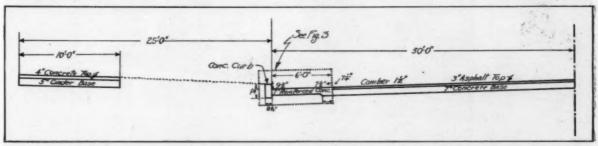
Showing a Typical Section of the Boulevard from Liberty Street to Mohawk Place
